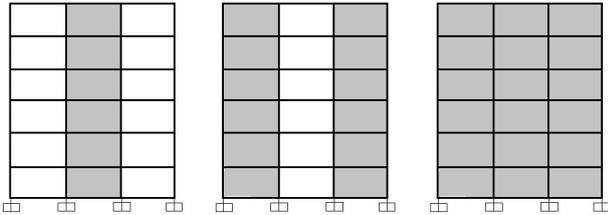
Six story building with 0-1-0, 1-0-1 and 1-1-1 infill wall configurations
